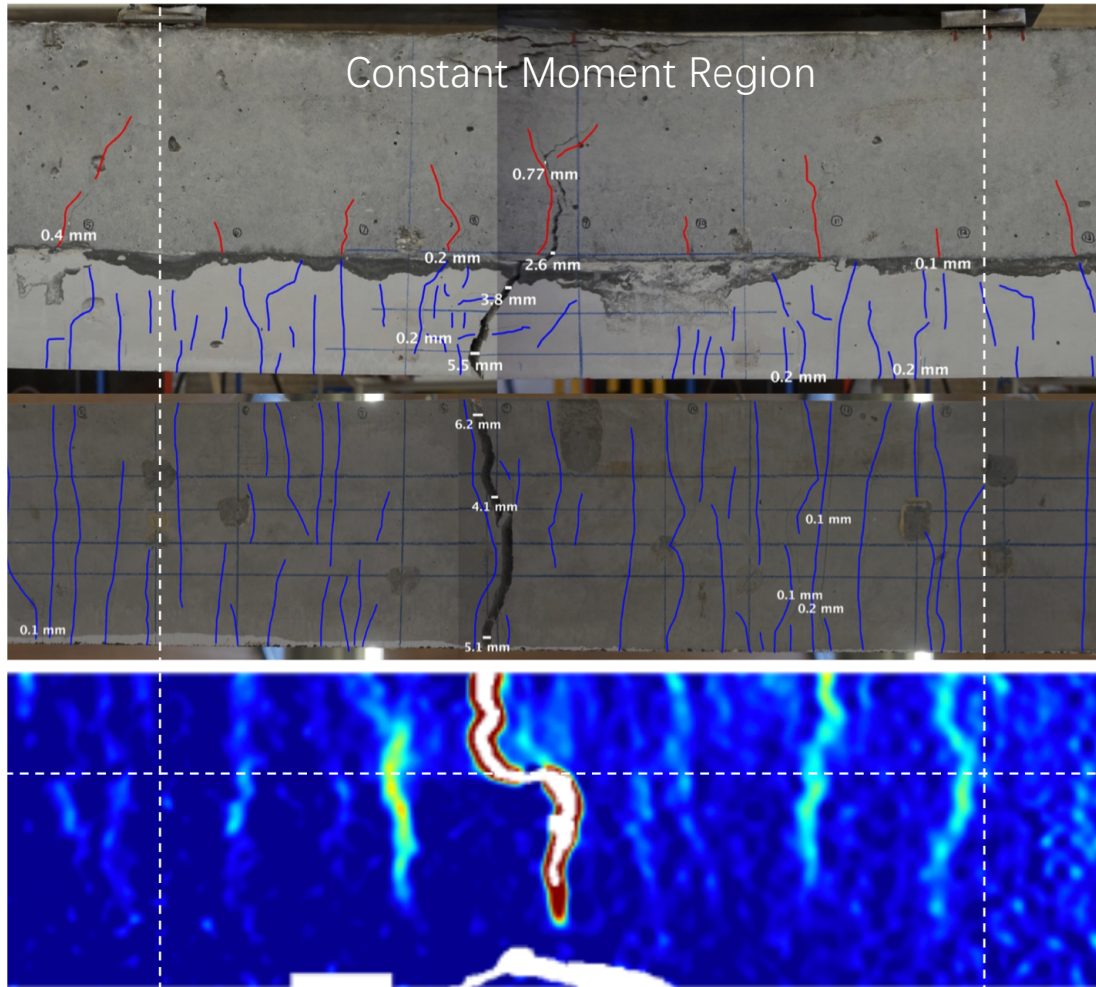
Crack pattern of Test 04 (beam with SHCC+SH layer of 70 mm)
